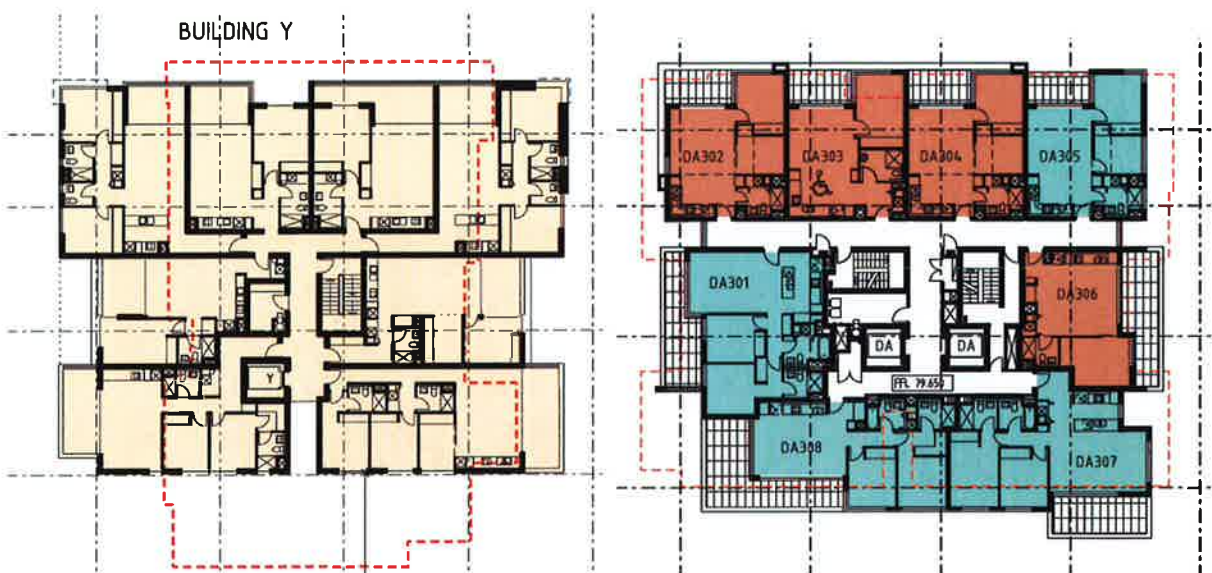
The Level 3 floor plan of Building Y / the Darwin Building as approved in Modification 1 to the Concept Plan (left) and proposed as part of this application (right)
